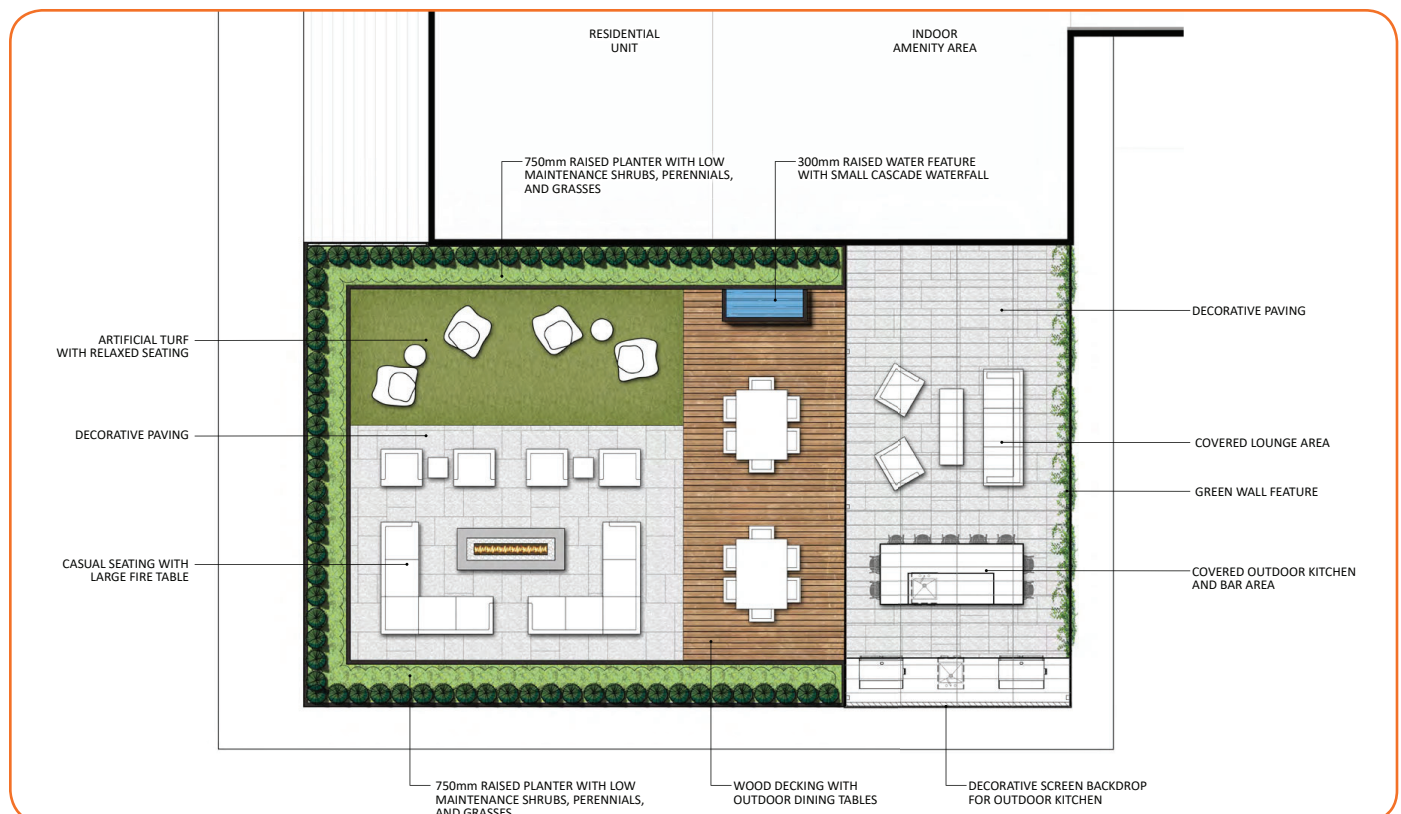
7th Floor Terrace: Prepared by Serefian Design Group.
